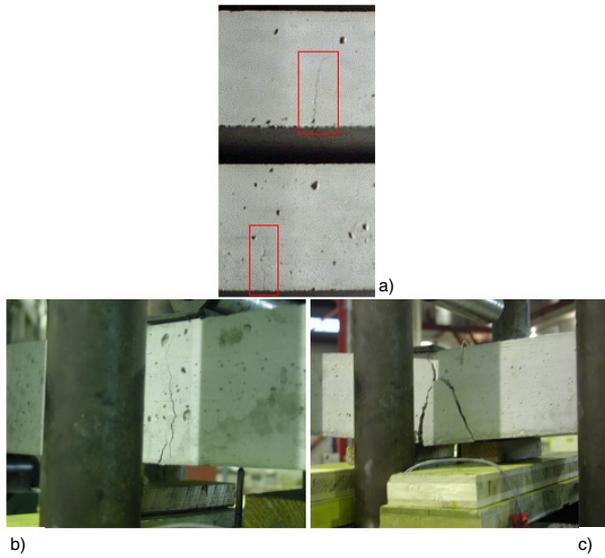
(a) Some cracks appearing on beam 1 immediately after load application; (b) beam 1 after rod 2 failure and (c) beam 1 at failure.
